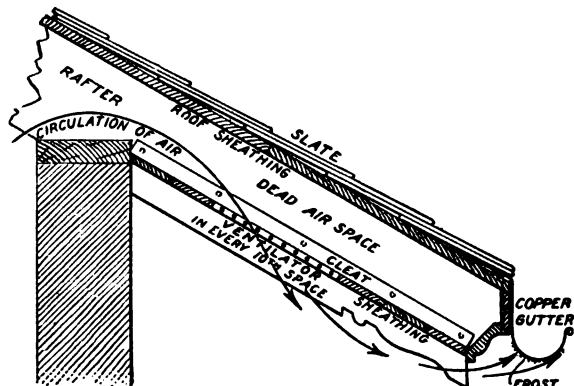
Explanation of Alleged Roof Leakage in Attic
